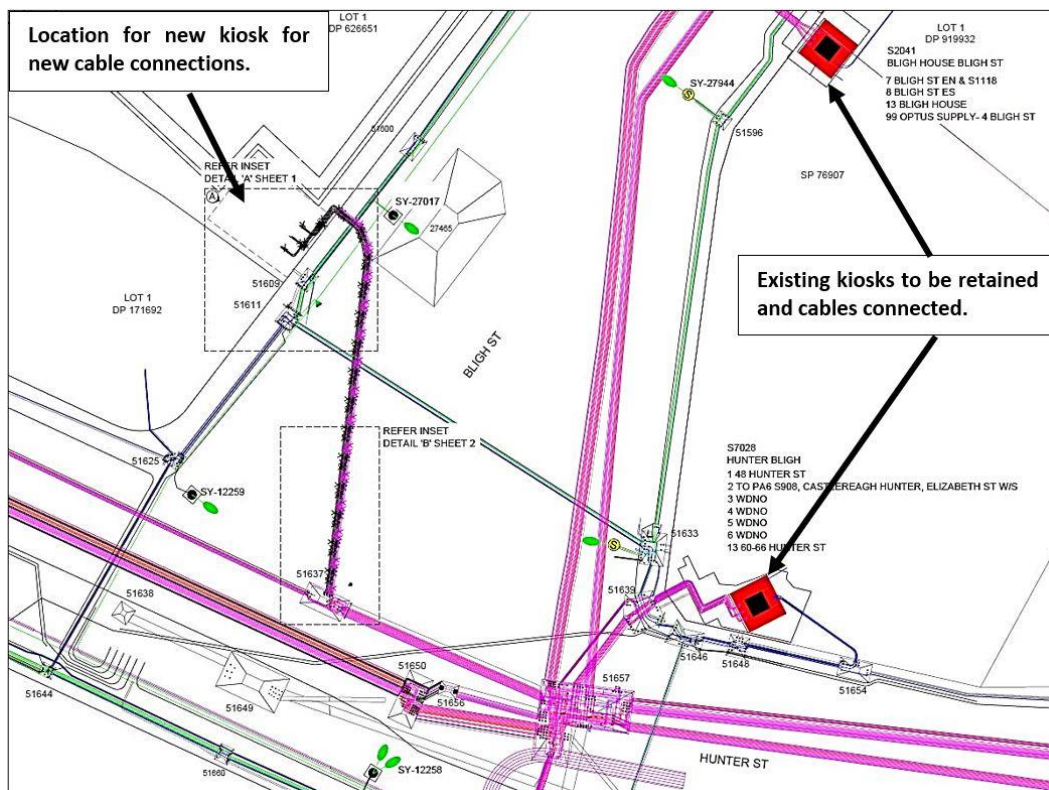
Layout plan for the HV cabling. Black identifies existing abandoned cables and new cables are pink.
